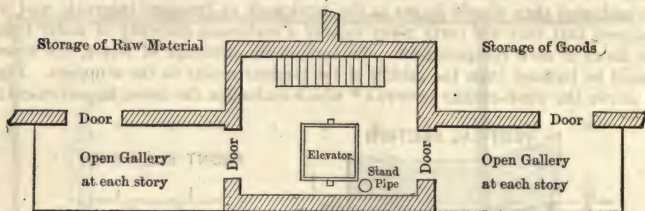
Stairway-tower and Galleries at Side of Storehouse
